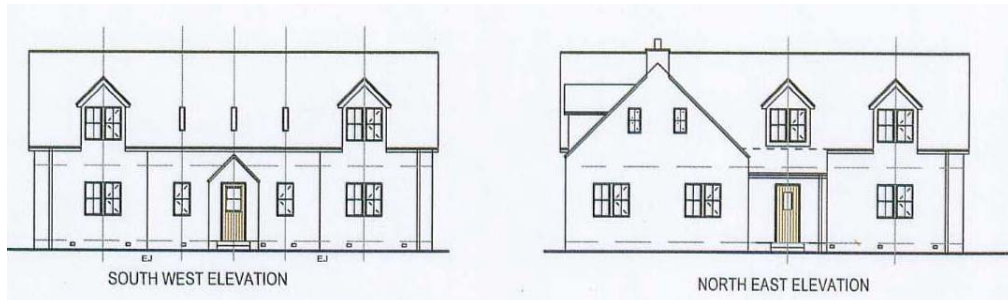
Front and rear elevations of indicative dwelling house type.
